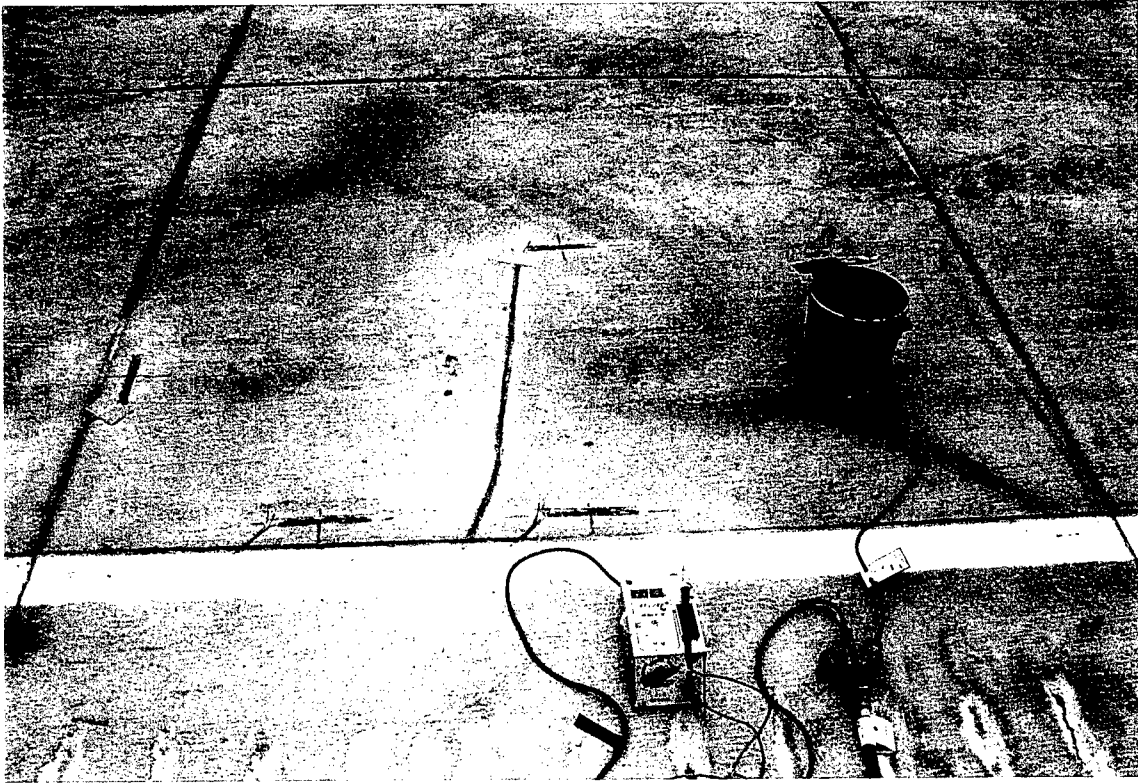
Typical Strain Gage Layout at CDOT Project #3
